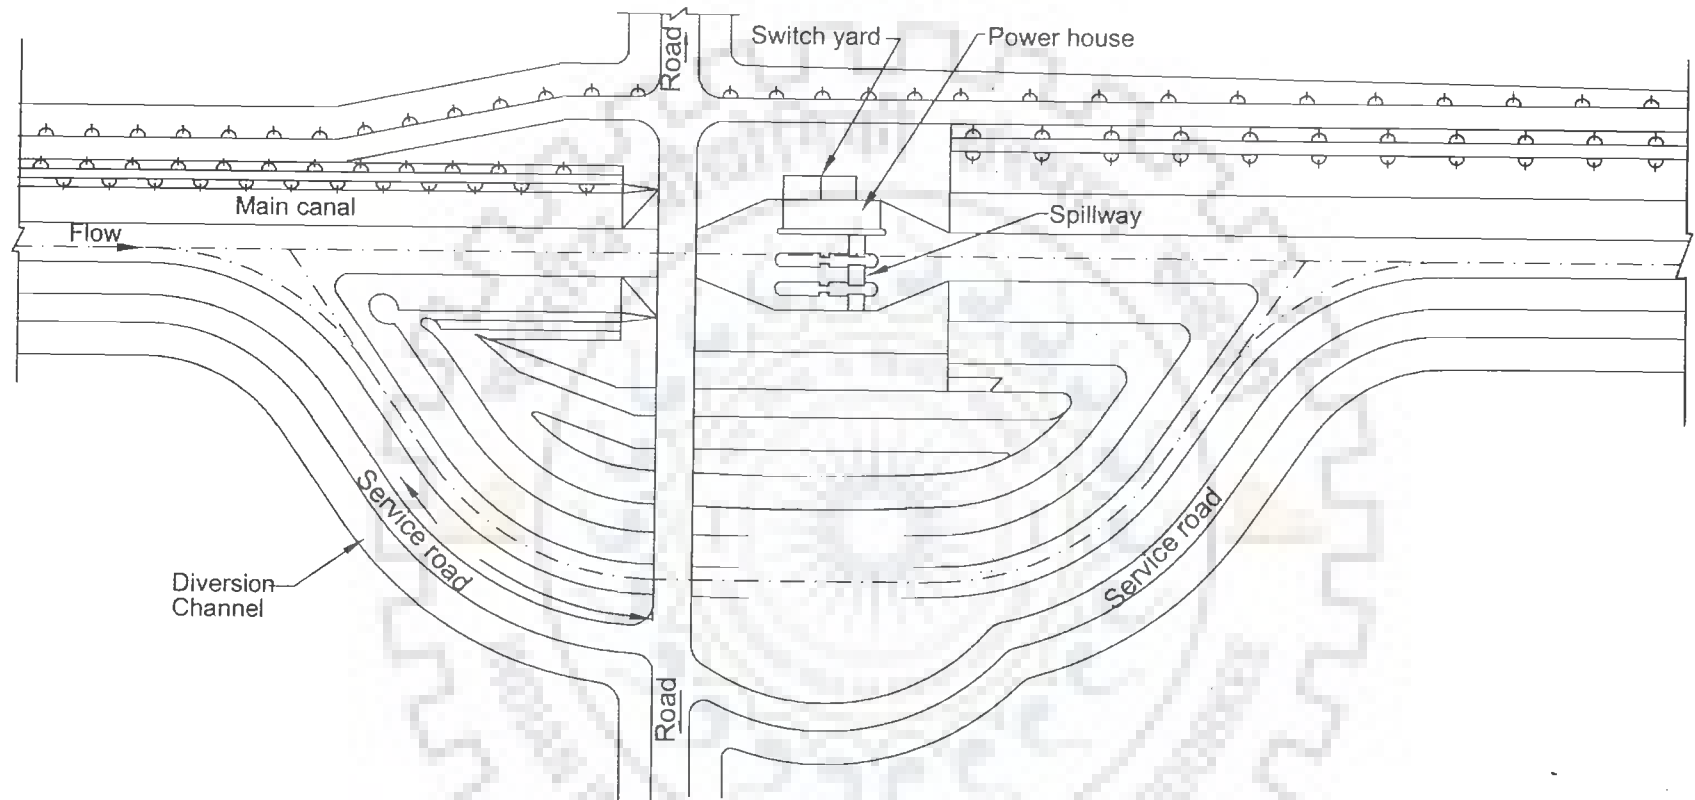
Layout of canal based SHP scheme having power house and spillway combined in main canal and diversion channel
